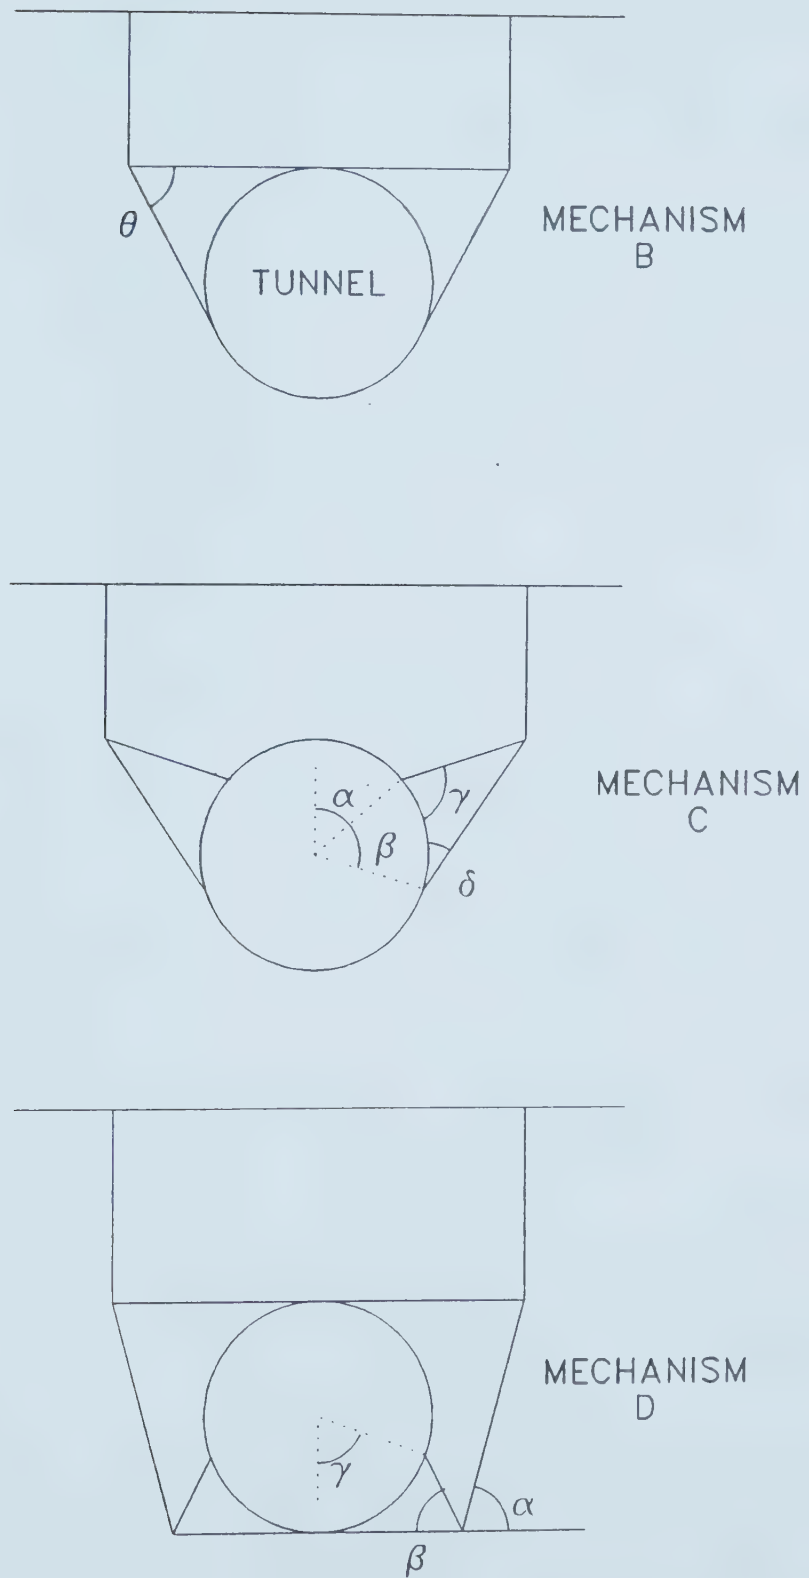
Some Failure Mechanisms of Shallow Tunnels
